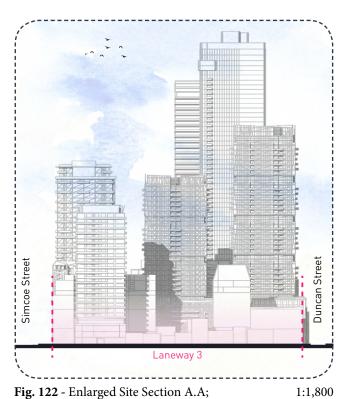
Enlarged Site Section A.A; 2014-, section
